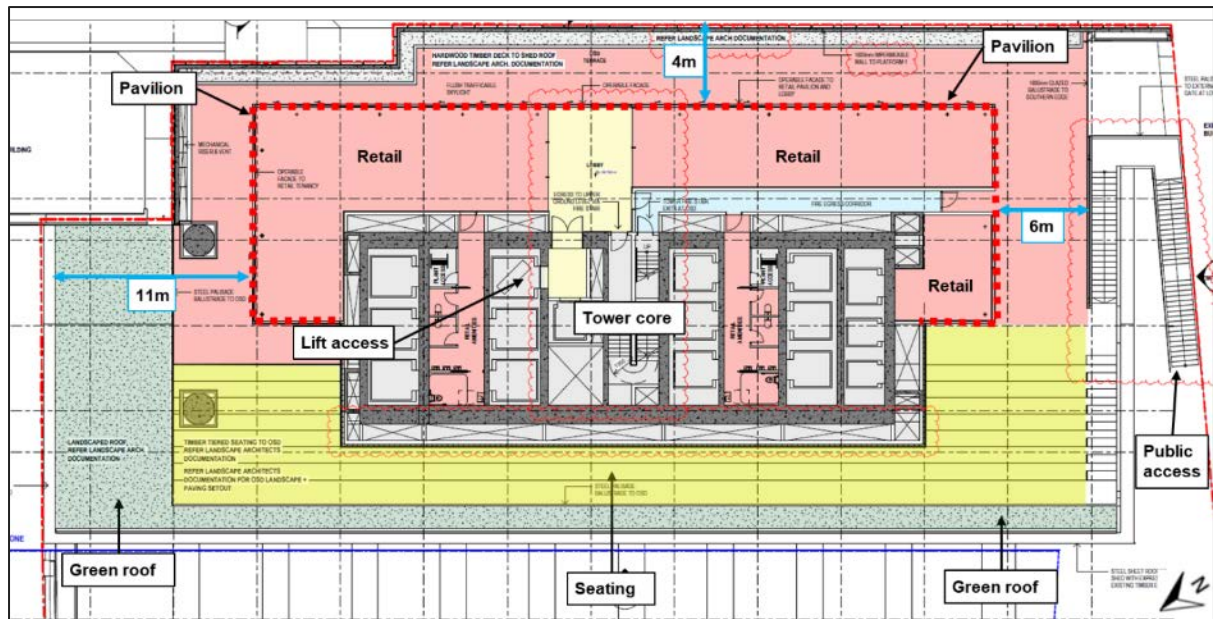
| Pavillion location, layout and setbacks (Base source: Applicants RtS)
